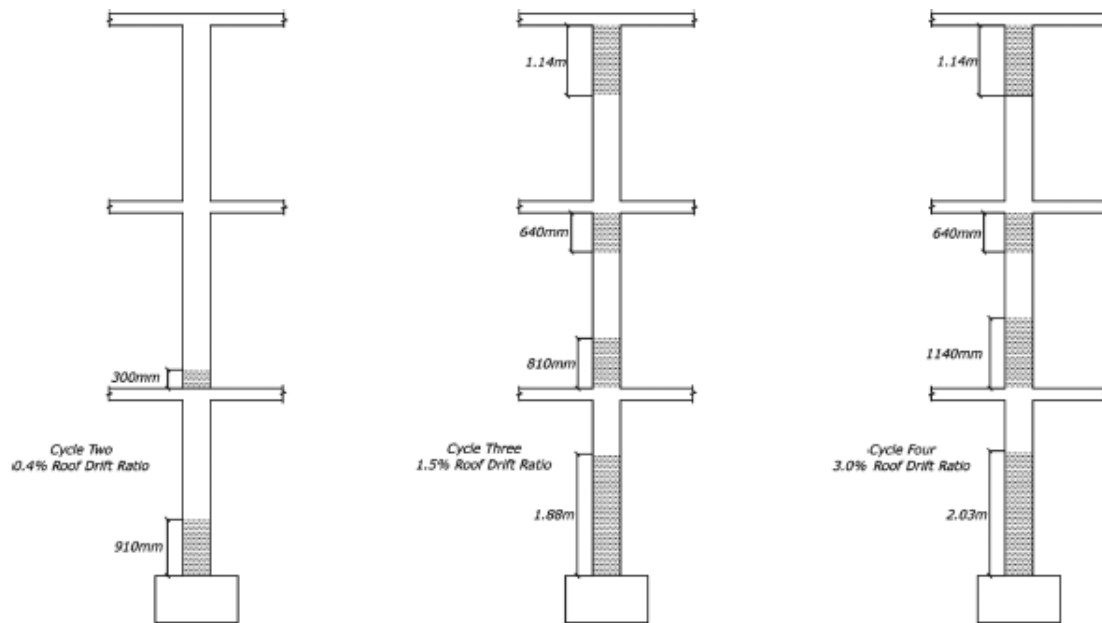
Cracking in the column, Fick et al., 2017 [3].
